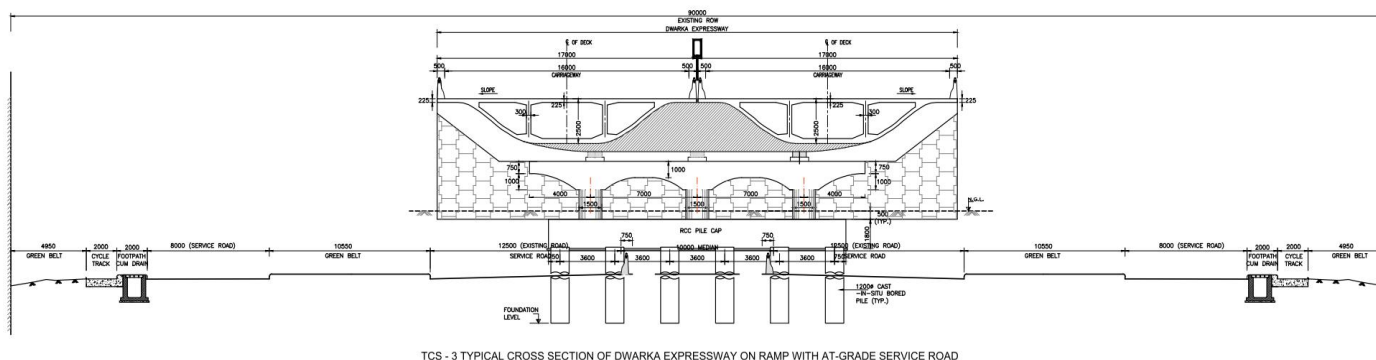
Typical Cross Section (TCS – 3) of Elevated Portion on Ramp with at grade Service Road
